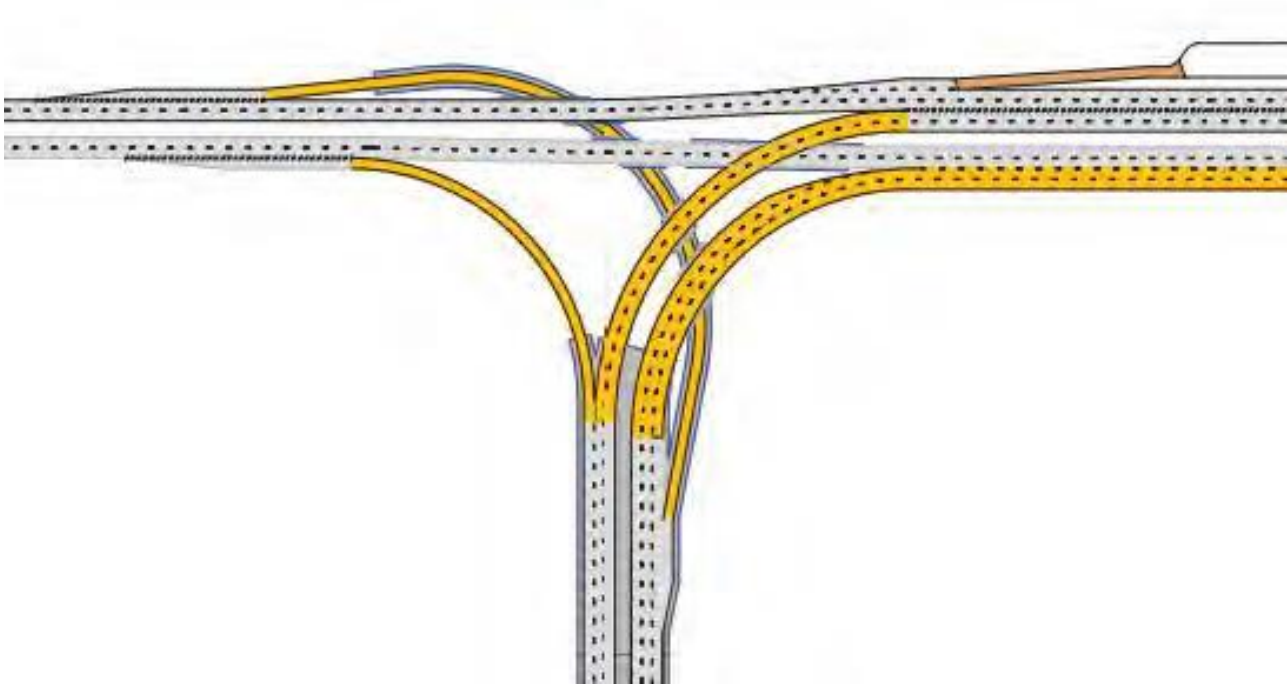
The new connection between A24(vertical) and A20(horizontal)
